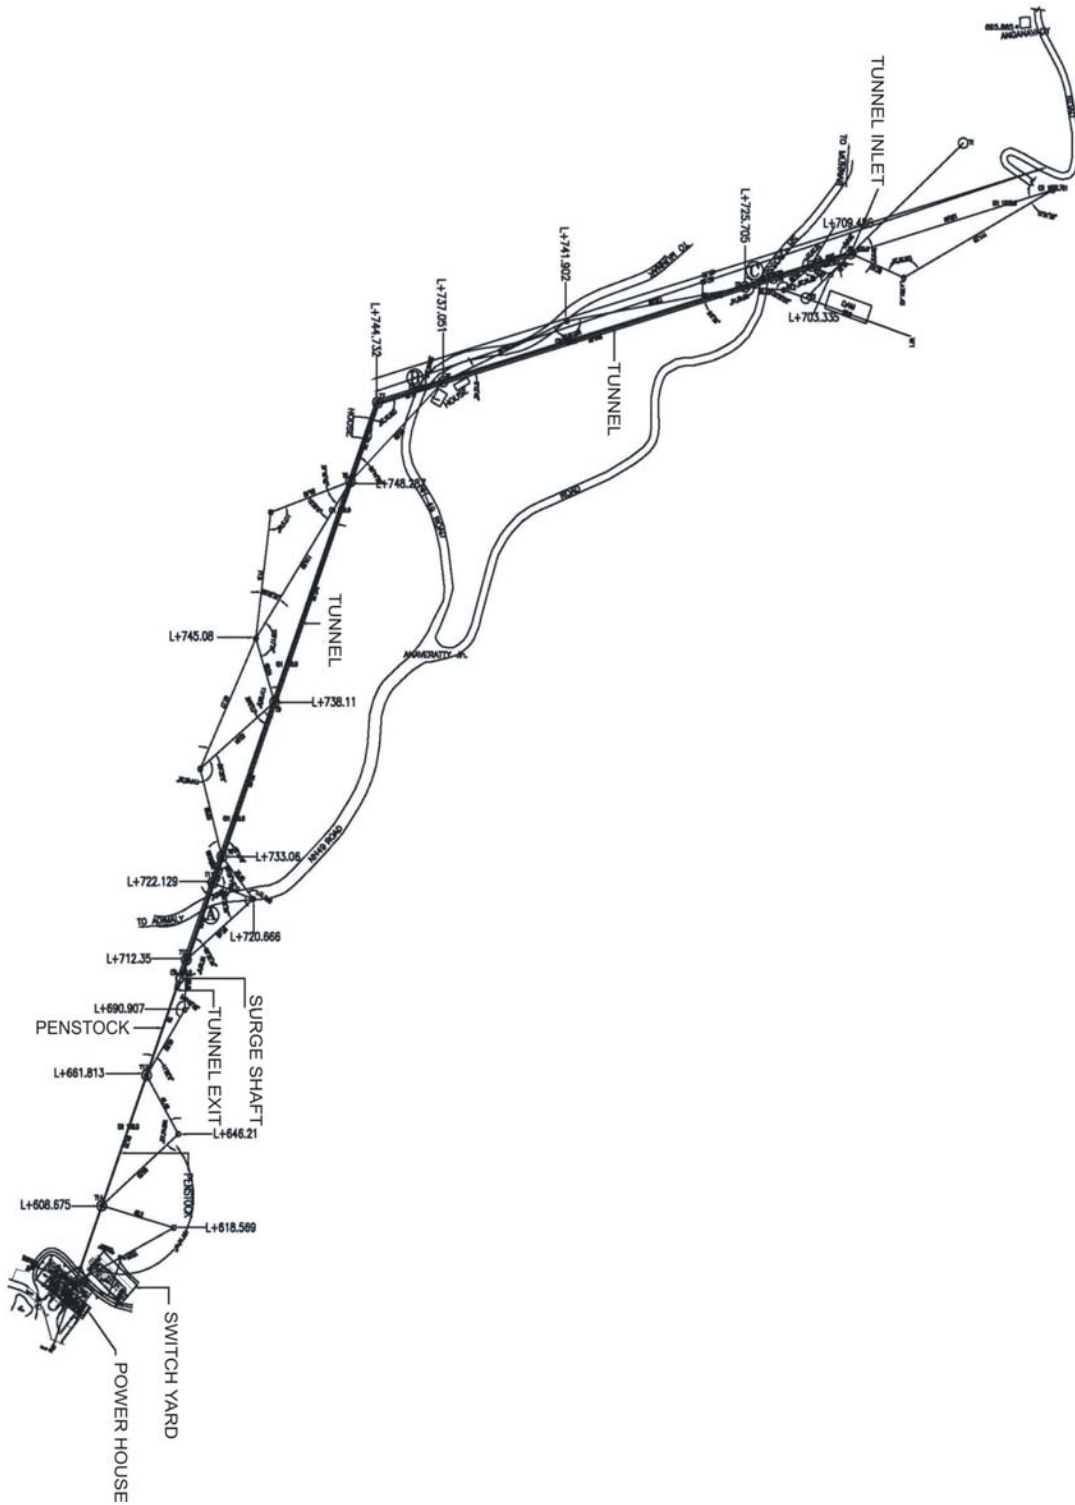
Typical Run of River Scheme Layout With Tunnel - 1
